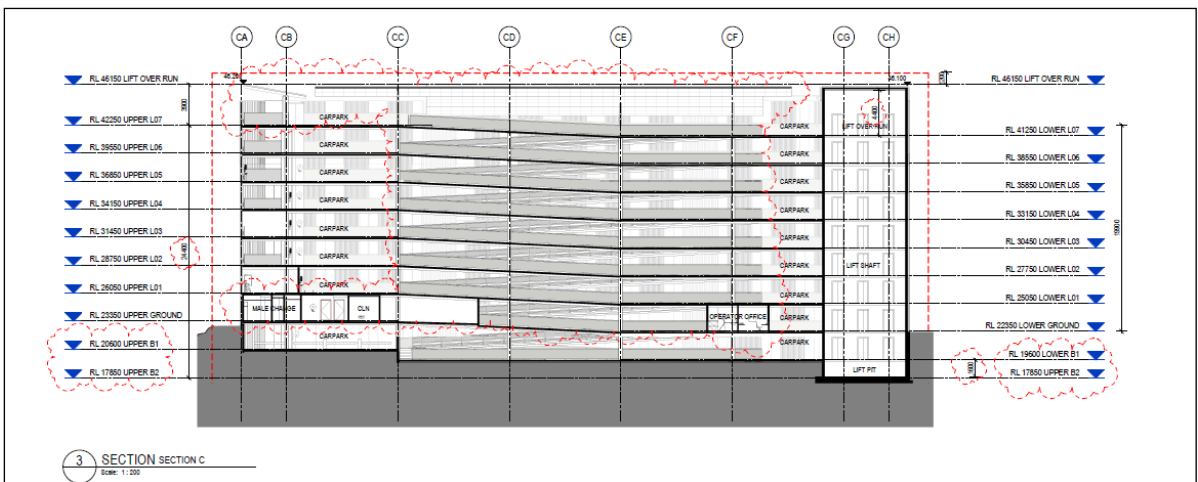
| Proposed section showing level changes for multi-deck carpark (Source: SSD-10353-Mod-3 Architectural Plans)
